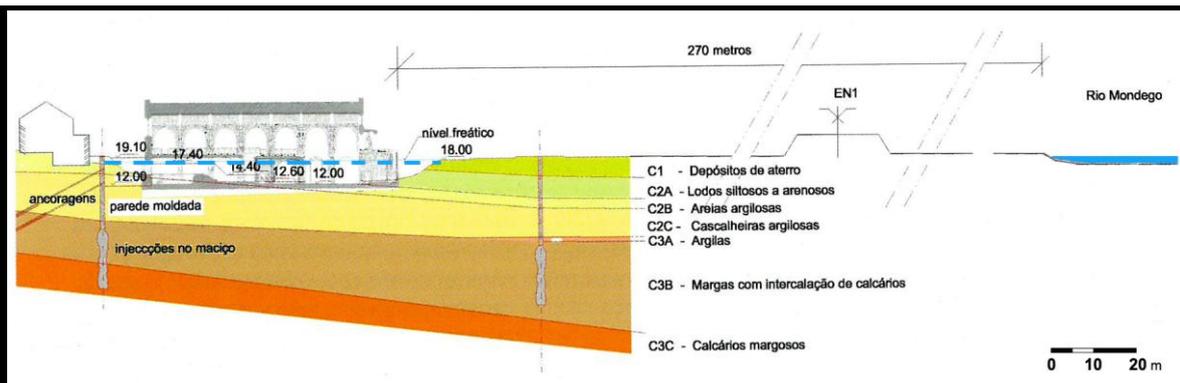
The Monastery of Santa Clara-a-Velha's cofferdam section
